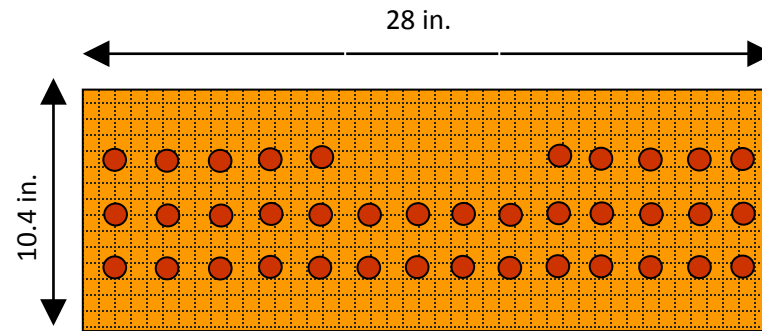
Finite Element Mesh of Girder Specimen G2
